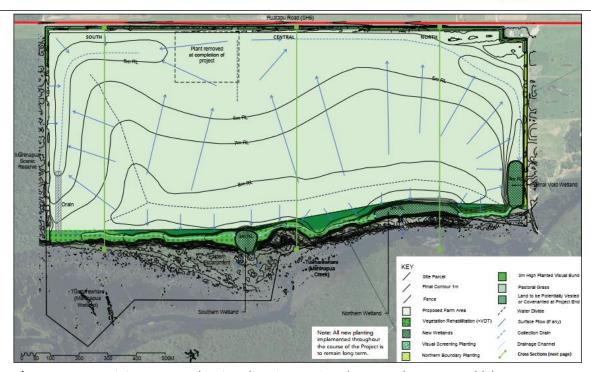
Post-mining contour showing elevation sections (Source: Glasson Huxtable)
